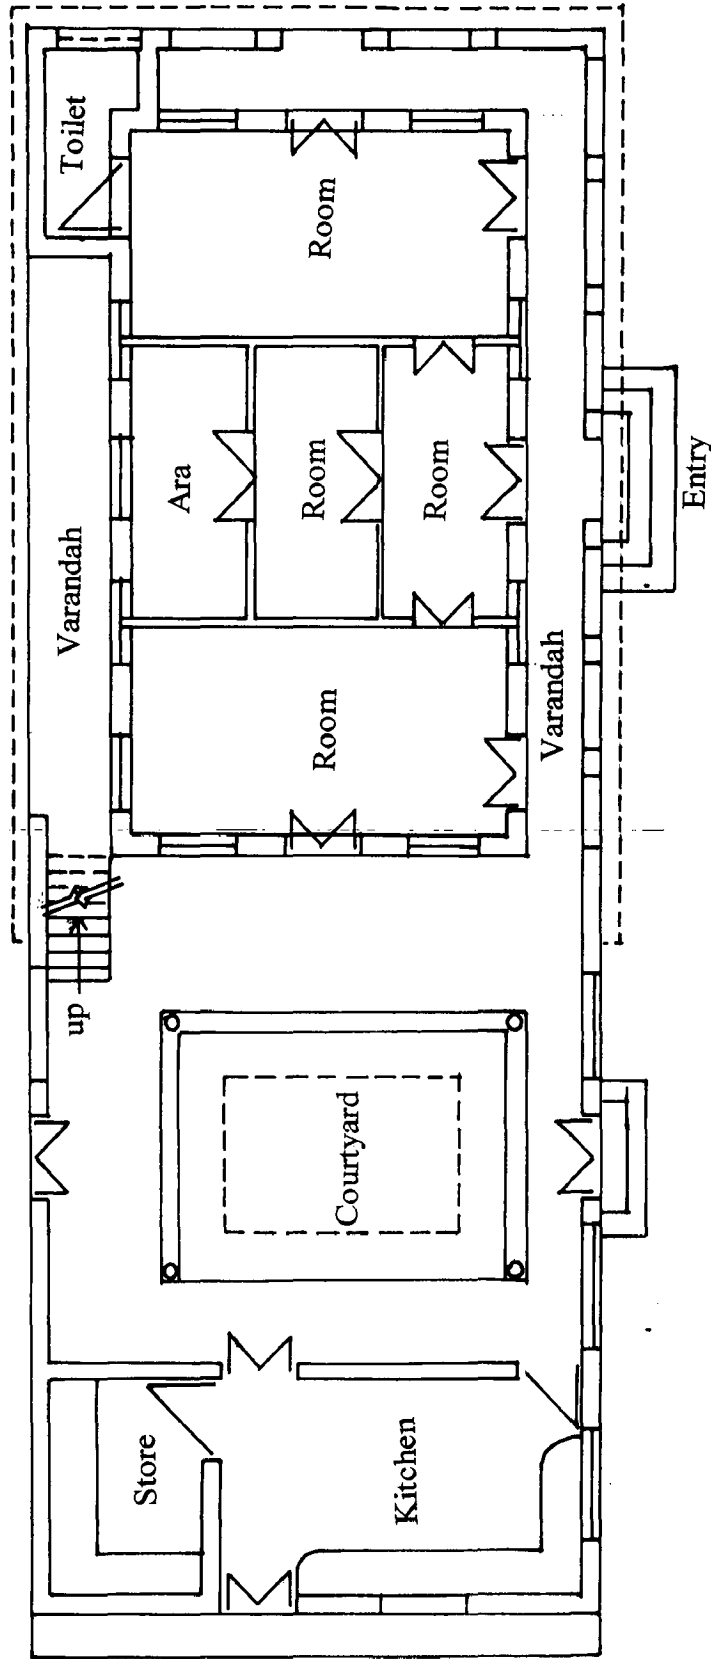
Ground Floor plan: *Medayil House*, Scale 1:100
